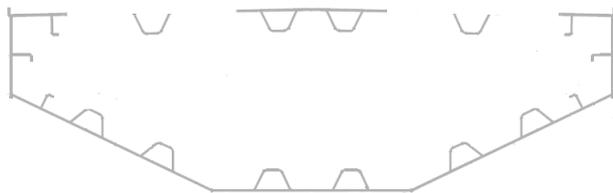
Railway girder cross sectional area used in the local multi-beam model.
